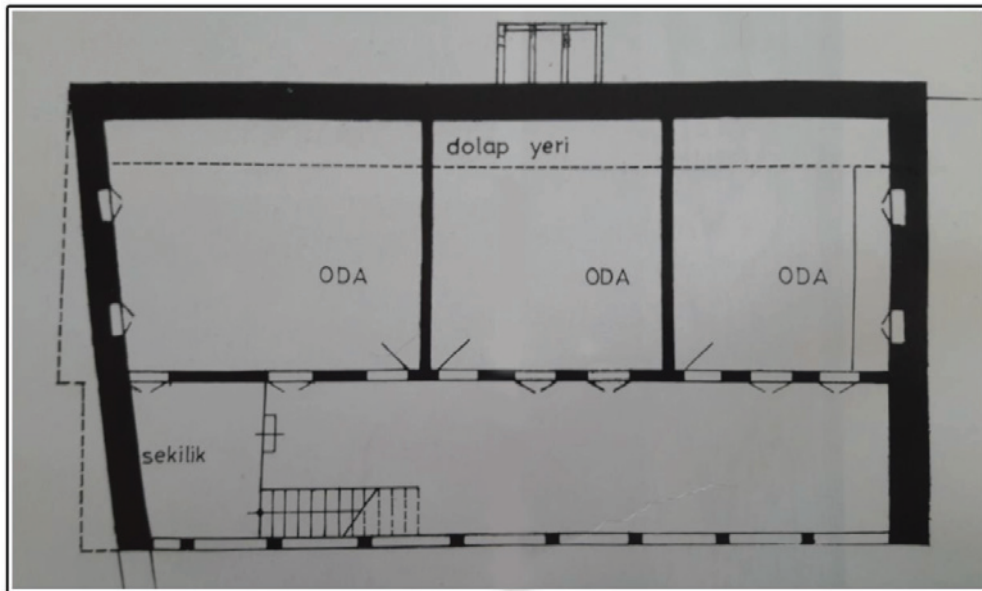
Ground floor plan of Muradiye House. (Source: Eldem 1984, p.100)
